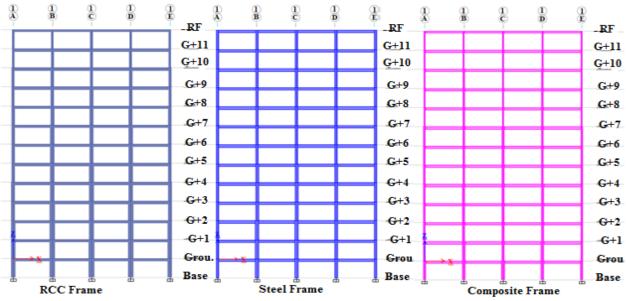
13: Elevation Model of RCC, Steel and Composite Frame for G+11 Alternatives
